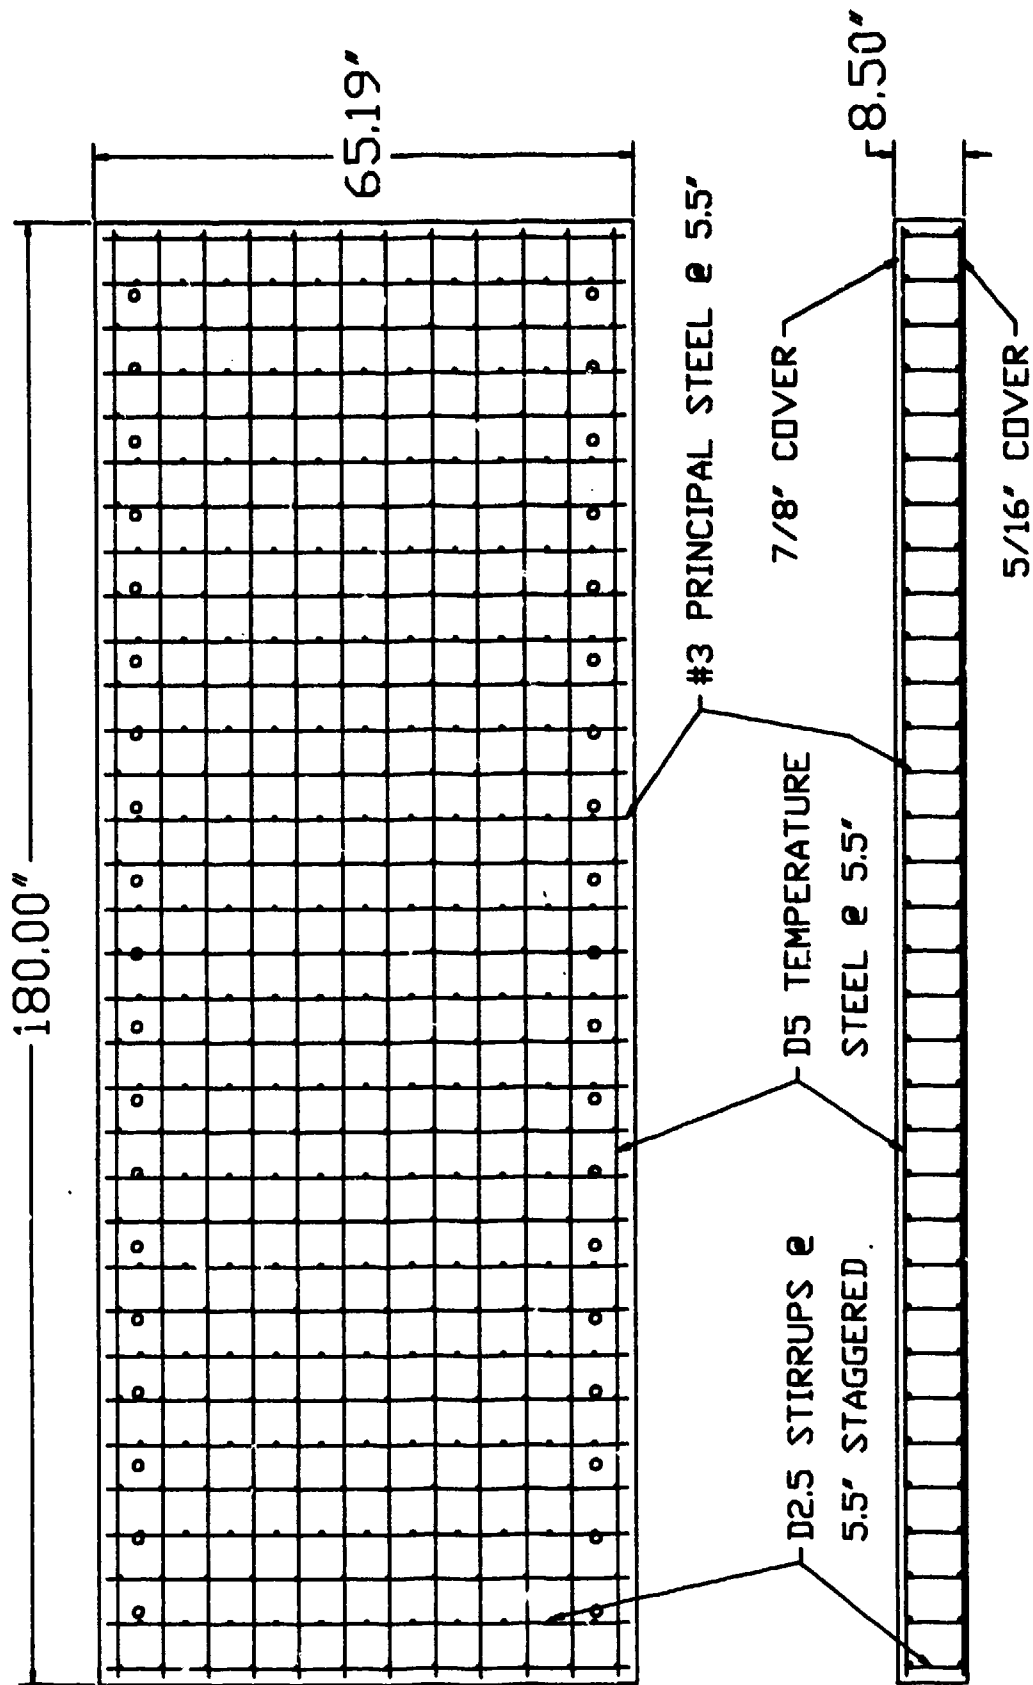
Reinforcement layout for wall panels 1 through 7.
